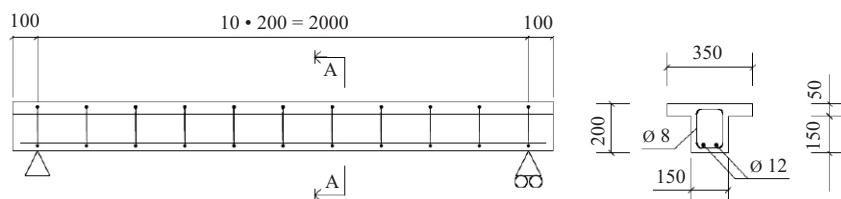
The geometry and the dimensions of a test beam loaded with sagging moment [14]
